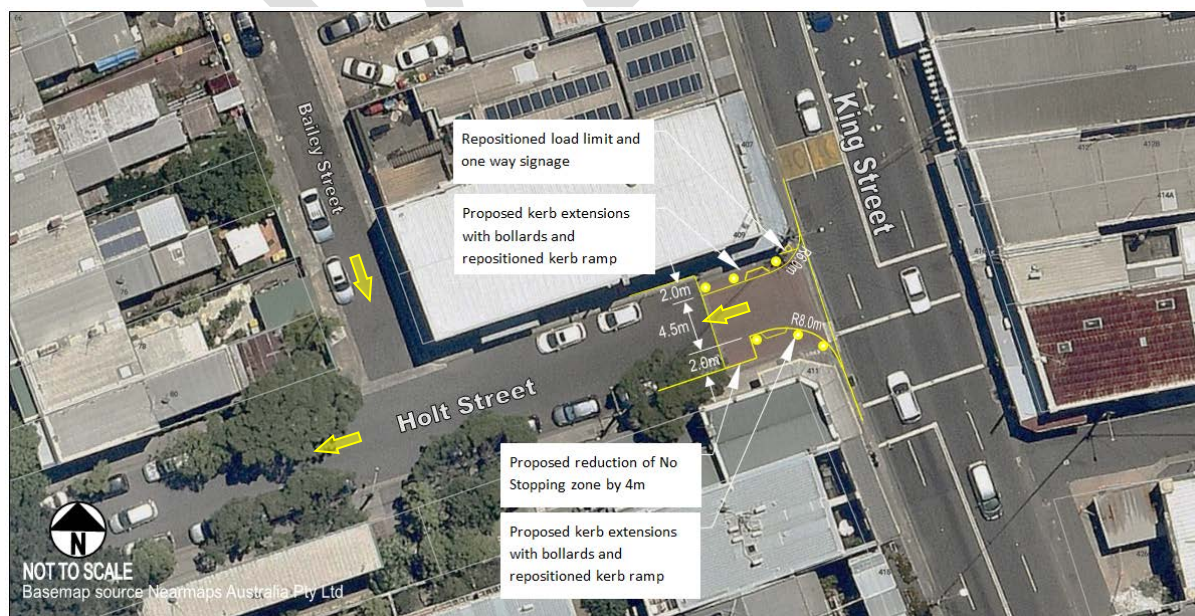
Stage 1 Holt Street proposed kerb extensions west of King Street
